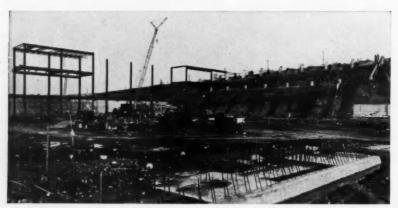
Embankment at north end of store is terraced with steel-beam and concrete-slab construction for architectural effect. For location of this embankment, see Fig. 1.
